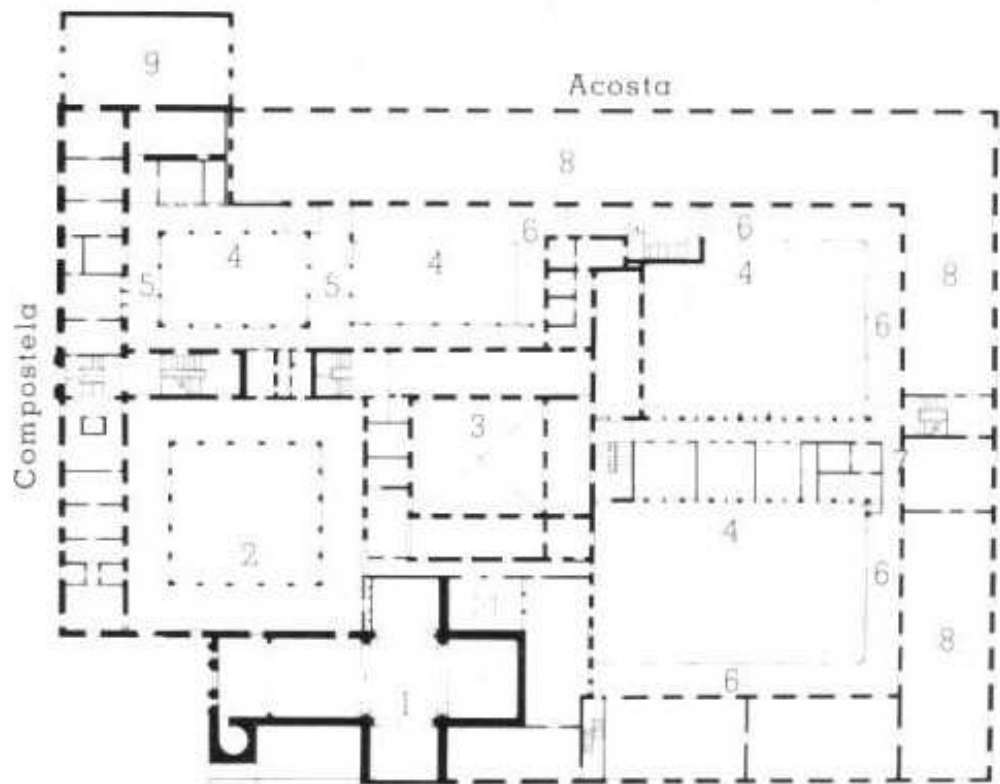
Convento de Belen floor plan, 1998 (Source: Martin & Rodriguez)
